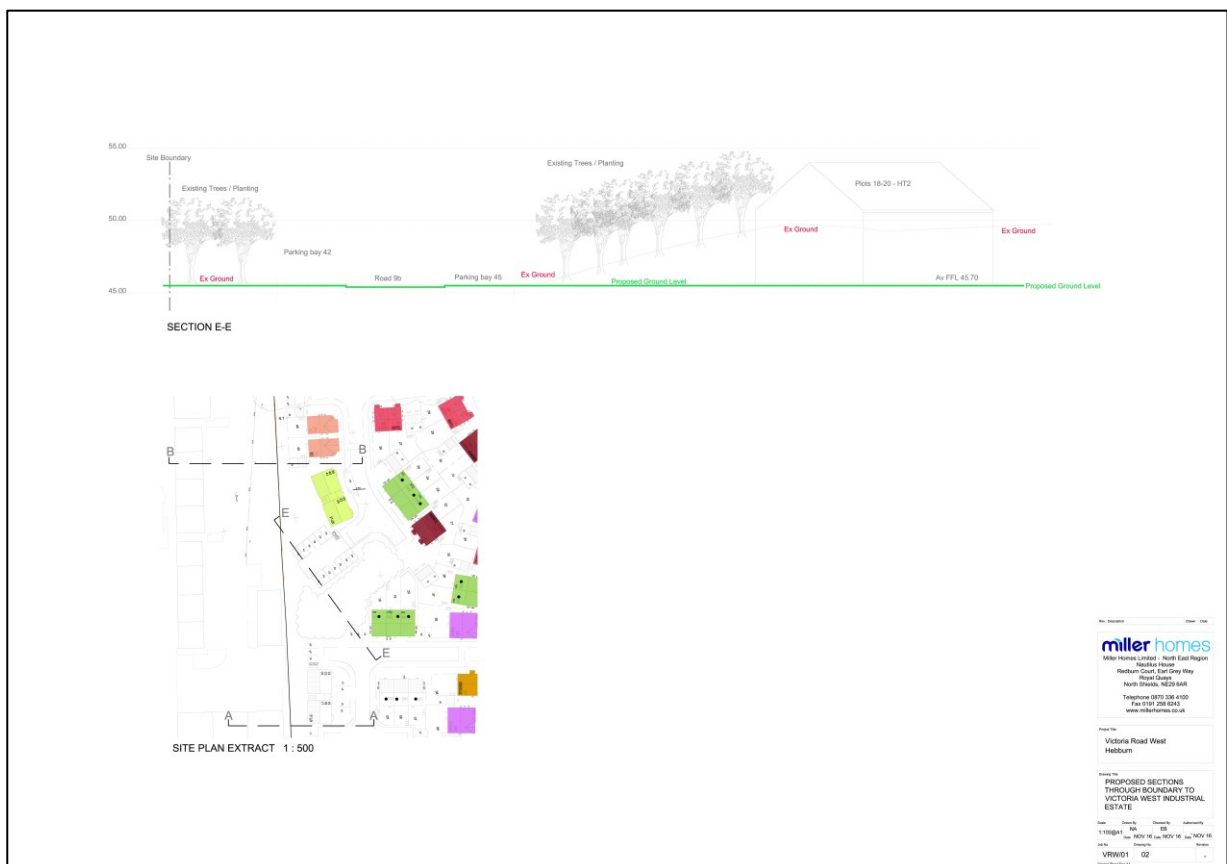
C: SECTION PLAN OF PROPOSED WORKS IN GROUP G11
